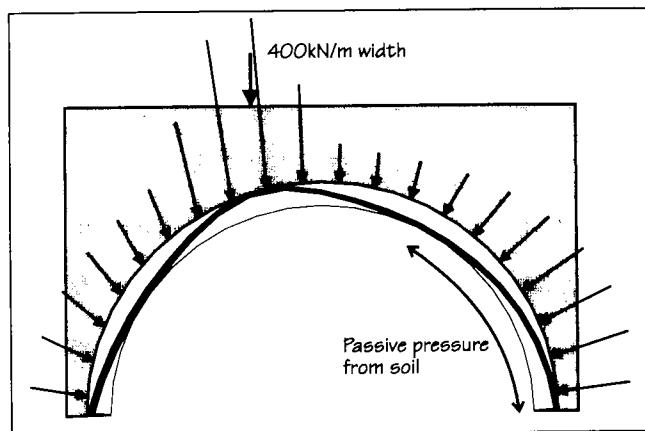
Fill exerting passive pressure for bridge at Bargower.
